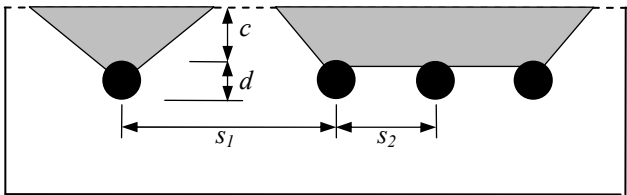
The geometric parameters affecting the spalling (Hunkeler 2006).
